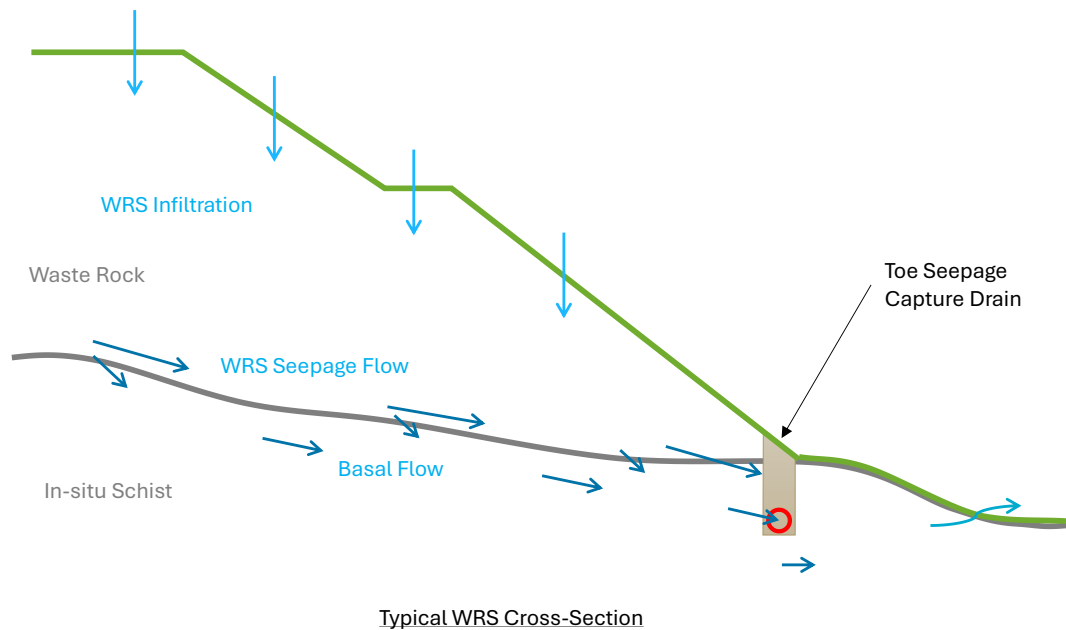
Typical Cross-section showing a Toe Seepage Capture Drain
